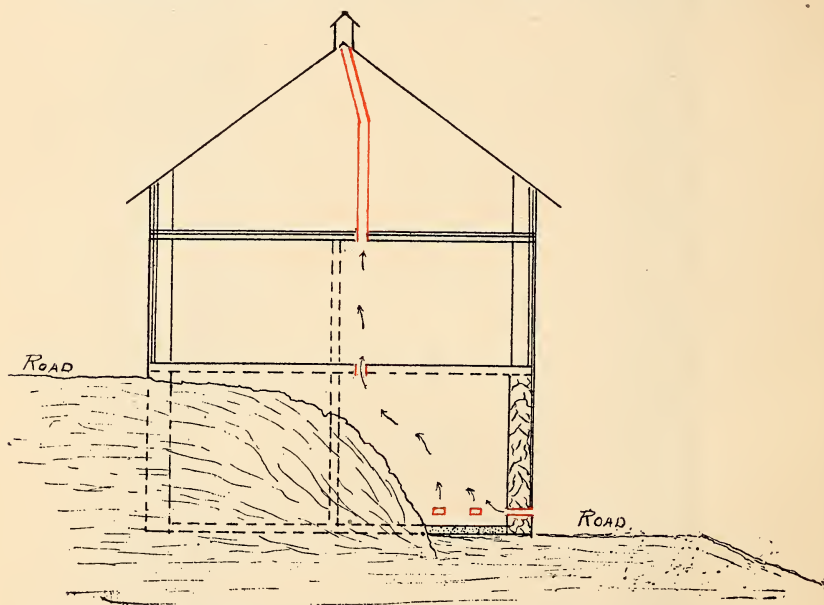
Cross-section of Mrs. Cone's apple house, showing position in hill and ventilating system.
